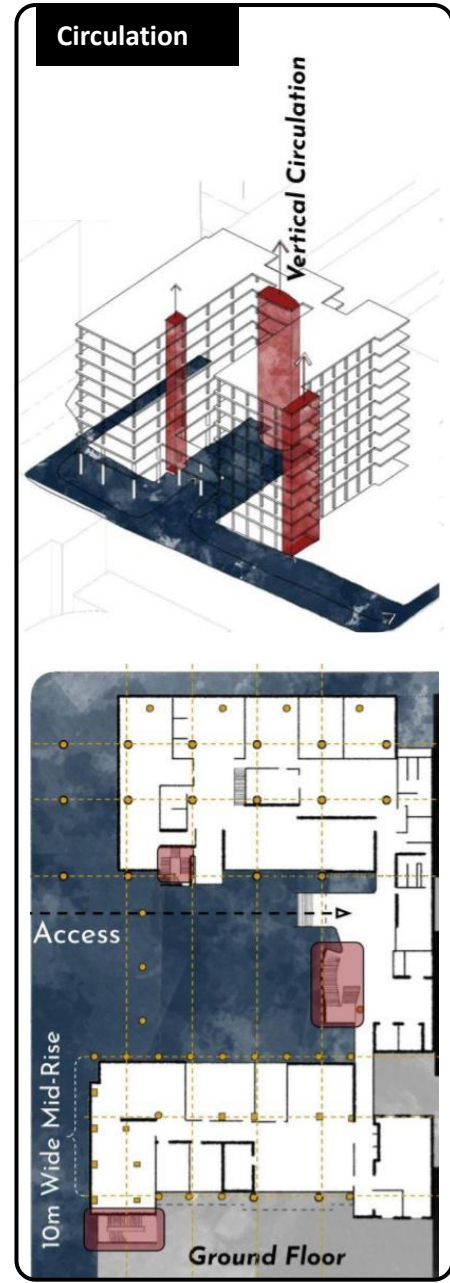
Building Axo (top) and Ground Floor Plan (bottom) showing Vertical Circulation (red) and 5m structural grid
